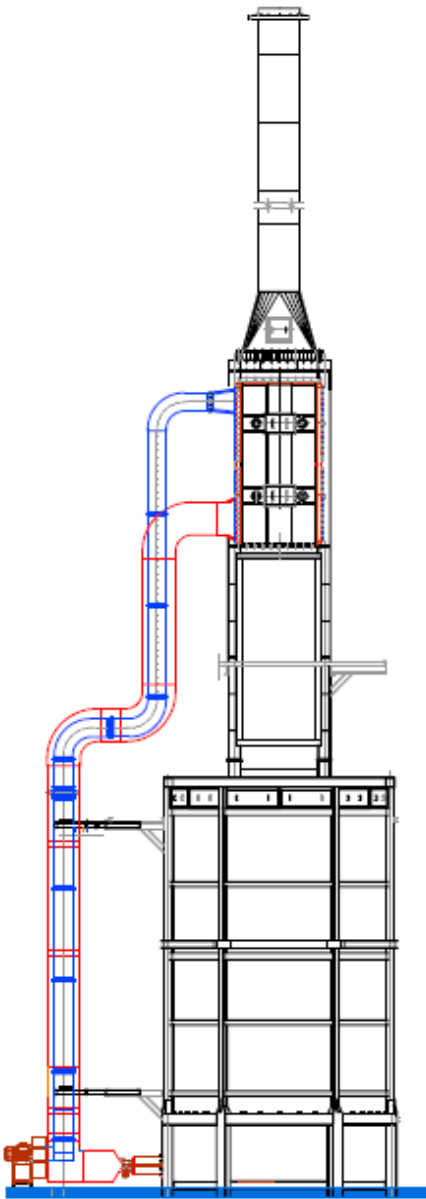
View of the pipe and of the air pre-heater (with two air passages) (initial general assembly):
